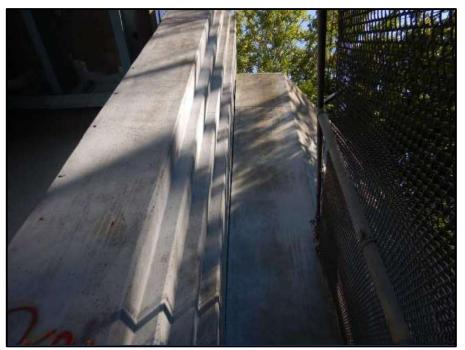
Looking north at northeast wingwall at forward abutment. Note: wingwall rotation east away from abutment.
